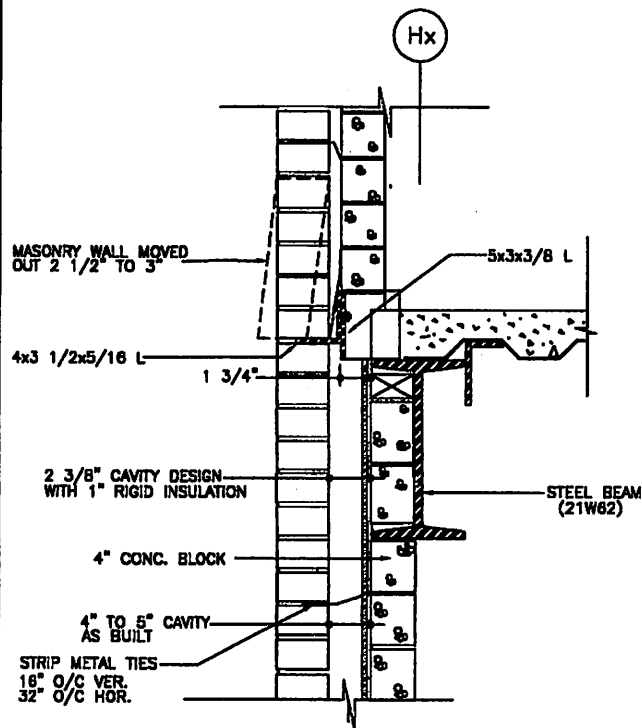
SECOND FLOOR SECTION - ORIGINAL DESIGN AND AS BUILT
